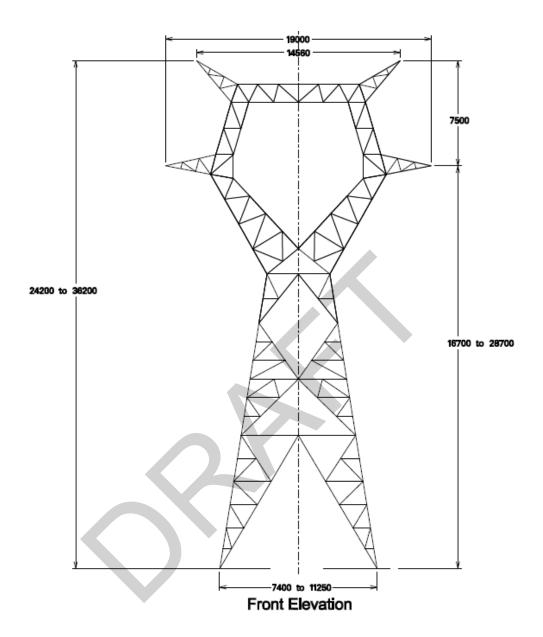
Proposed 400 kV Angle C-IVI-1 Lattice Tower
